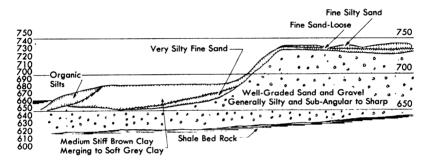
Soil profile in northwest-southeast direction through building area.
